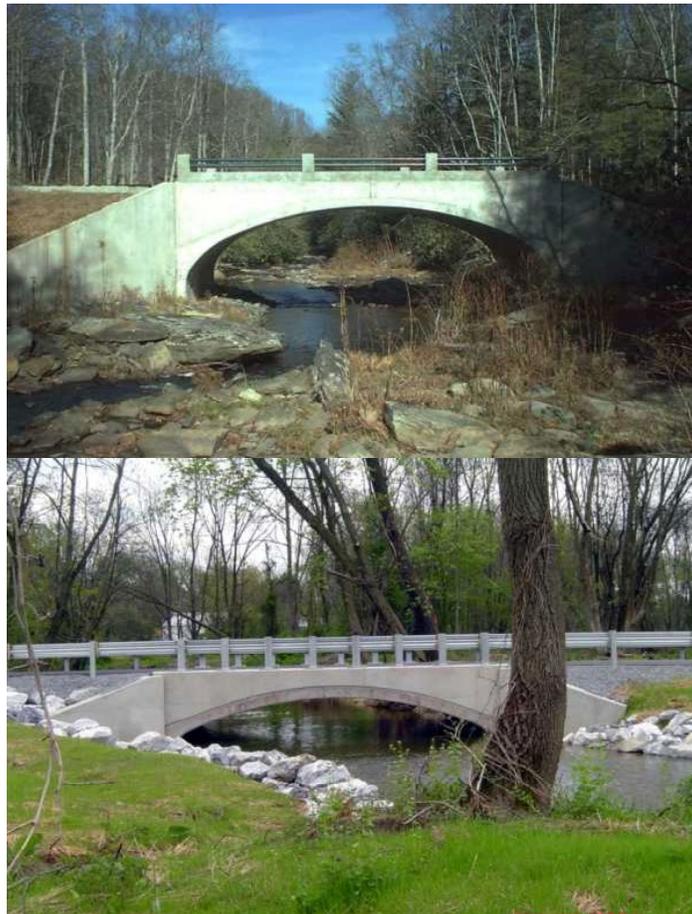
Examples of Bottomless Arched Culvert Crossings
